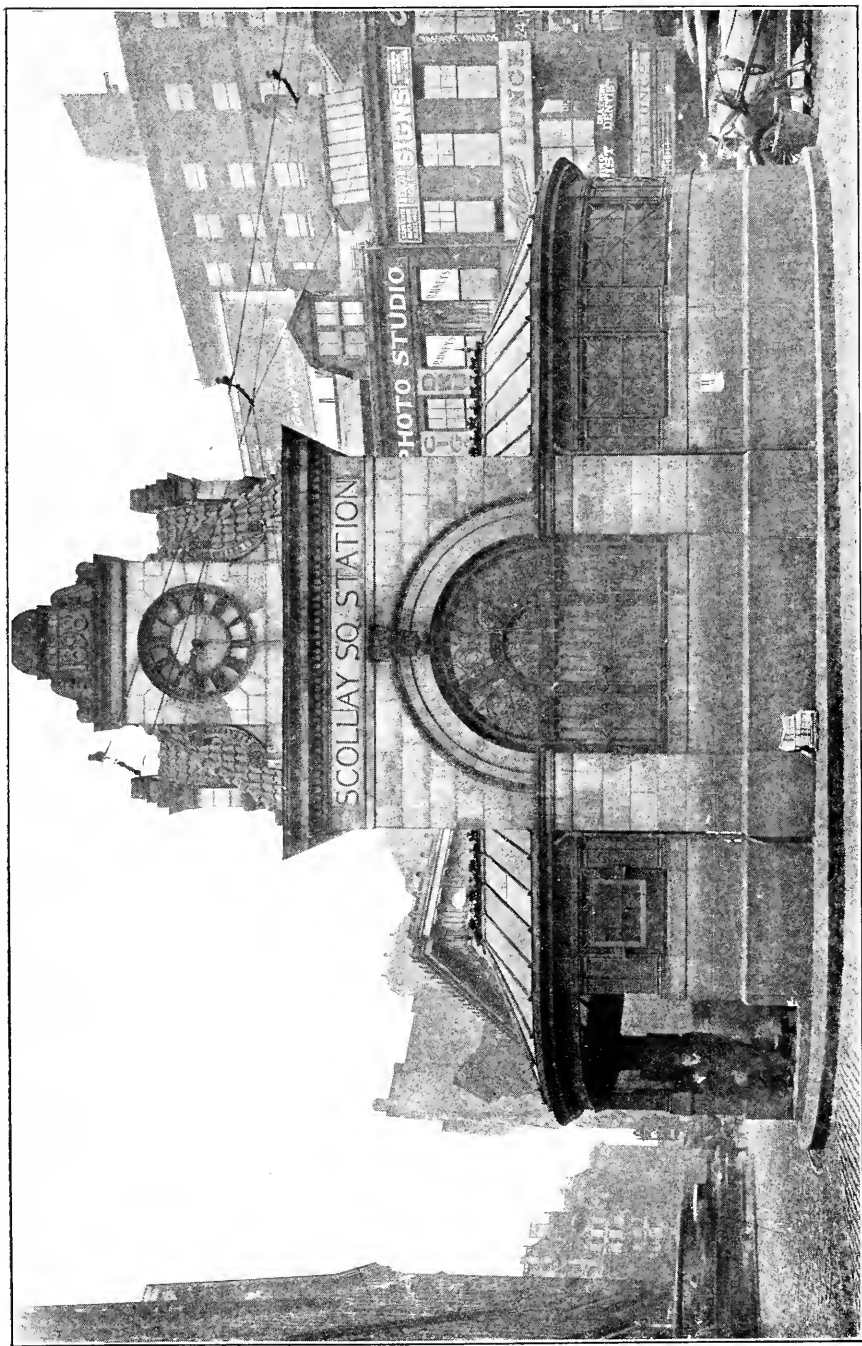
PLATE XV.—OLD STRUCTURE OVER STAIRWAY, SCOLLAY SQUARE STATION.
